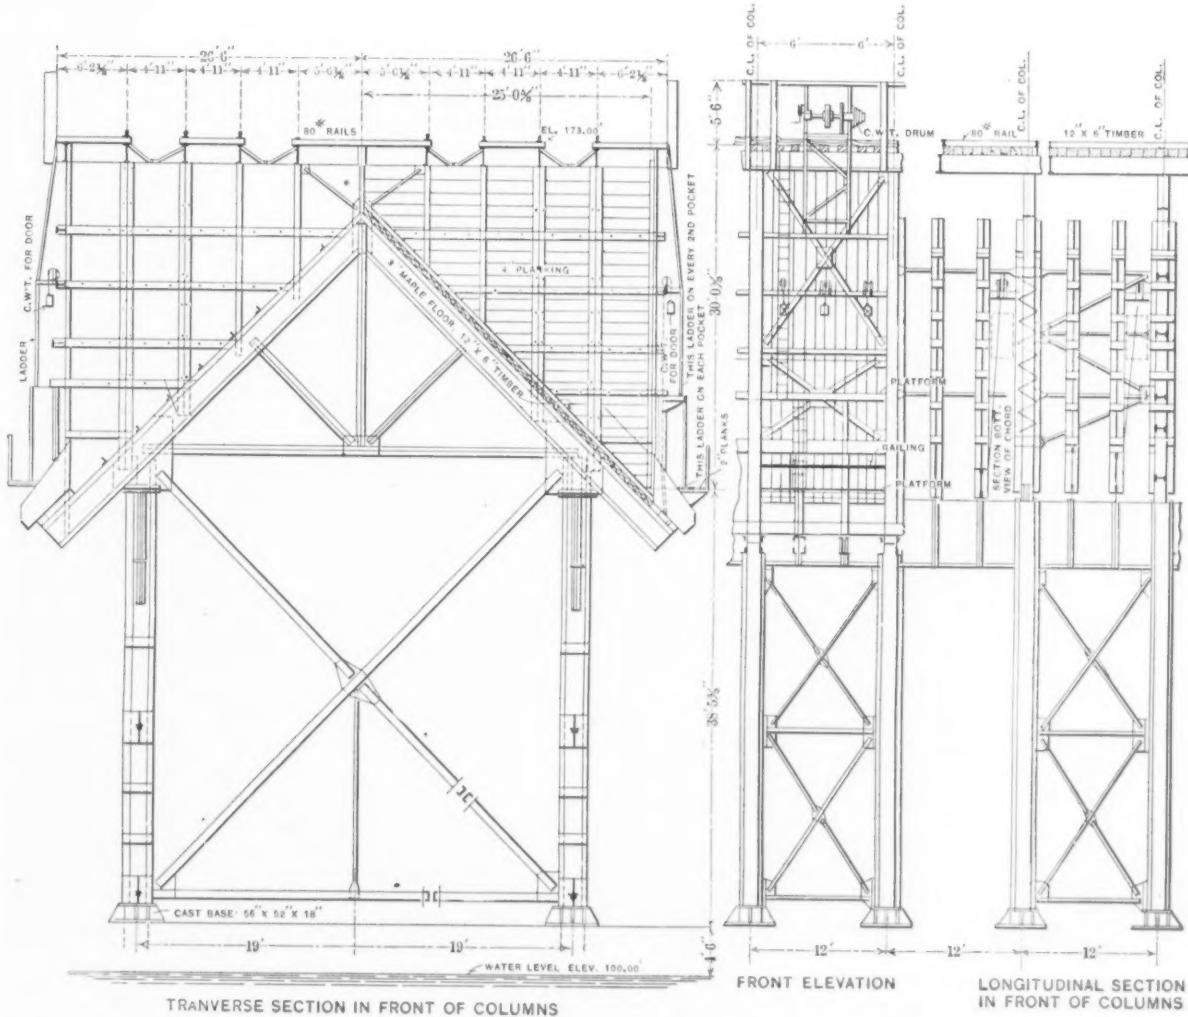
Sections and Front Elevation of the Steel Structure at Columns
